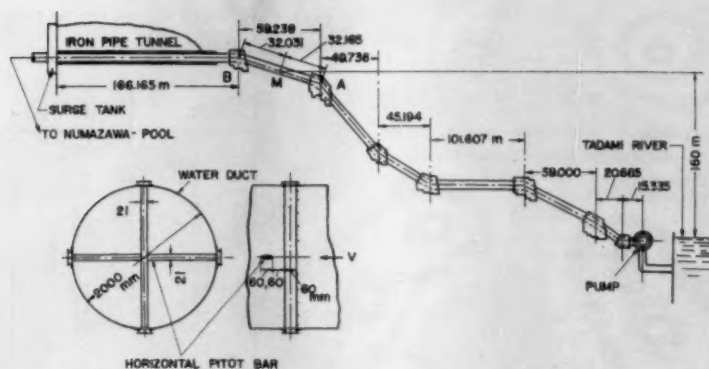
ELEVATION OF PUMP-DELIVERY DUCT AND POSITION OF TWO PITOT-TUBE BARS IN DUCT
